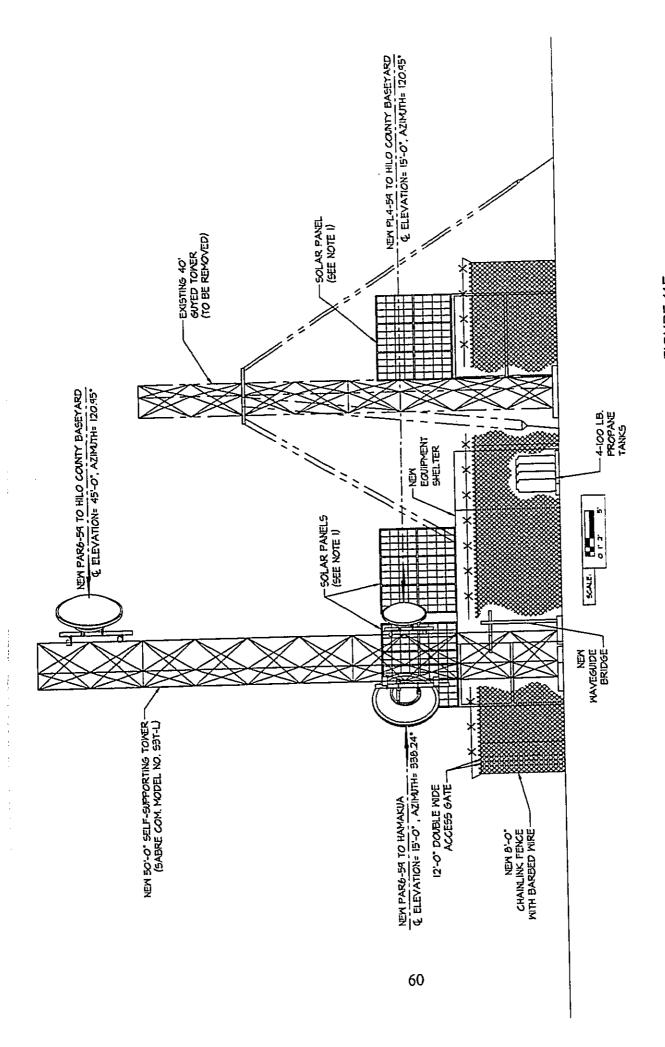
E lolehaehae / Elevation Plan (looking north) county of HAWAII EMERGENCY RADIO FACILITIES
